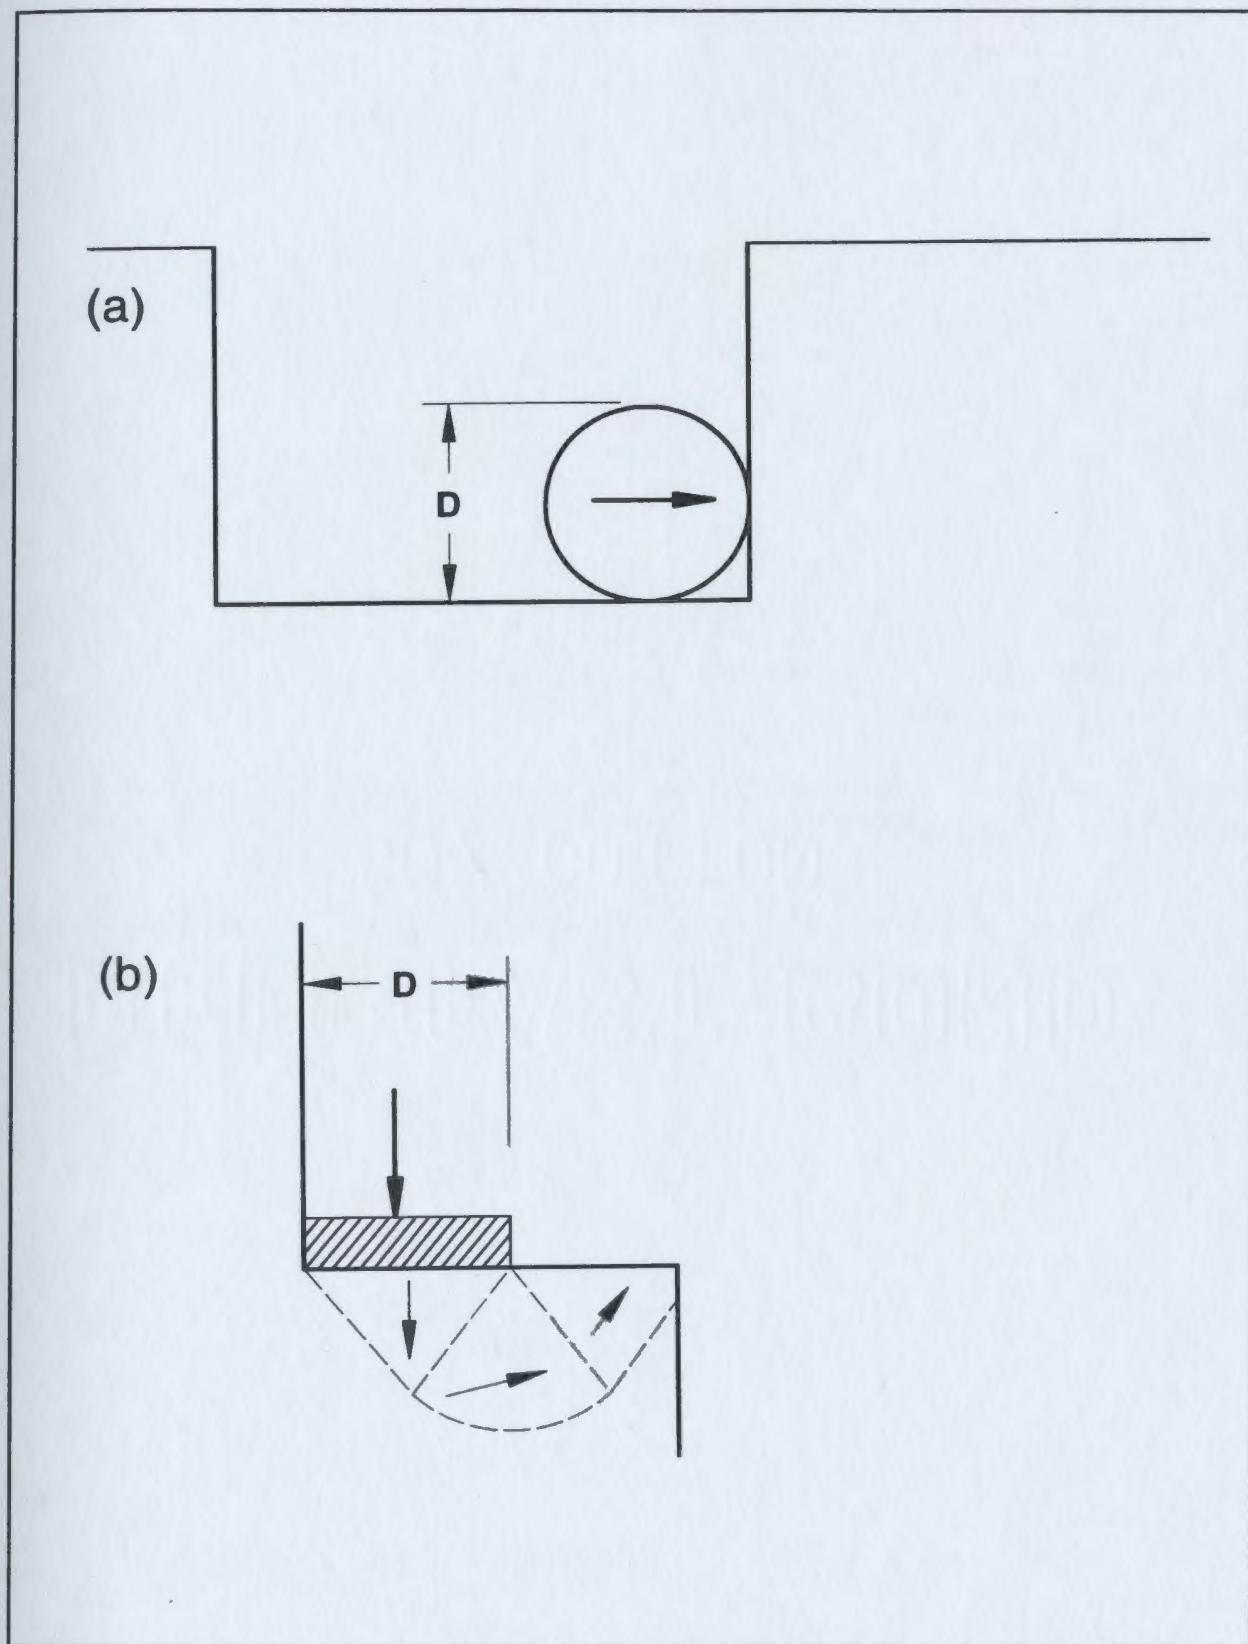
Proposed analogy between interaction with the trench wall and bearing capacity failure.
